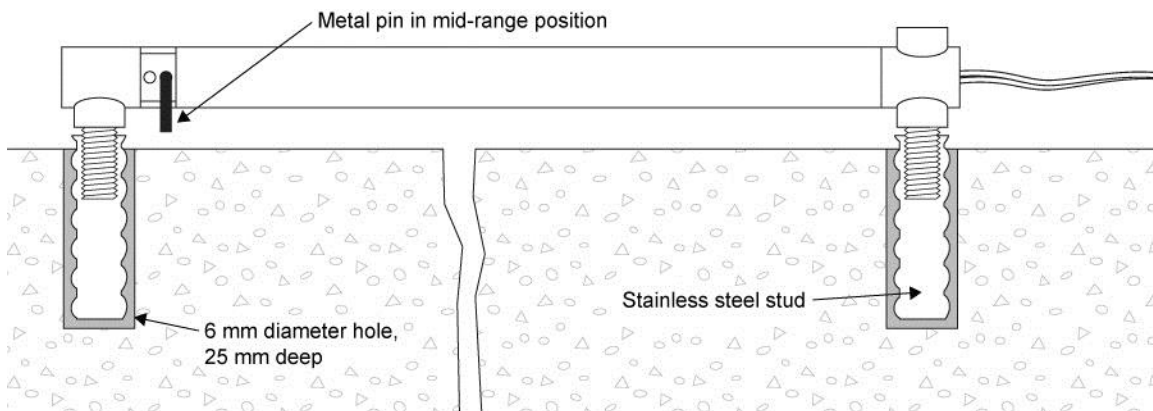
Model 4422-1 Monument Crackmeter, Groutable Anchor Type
